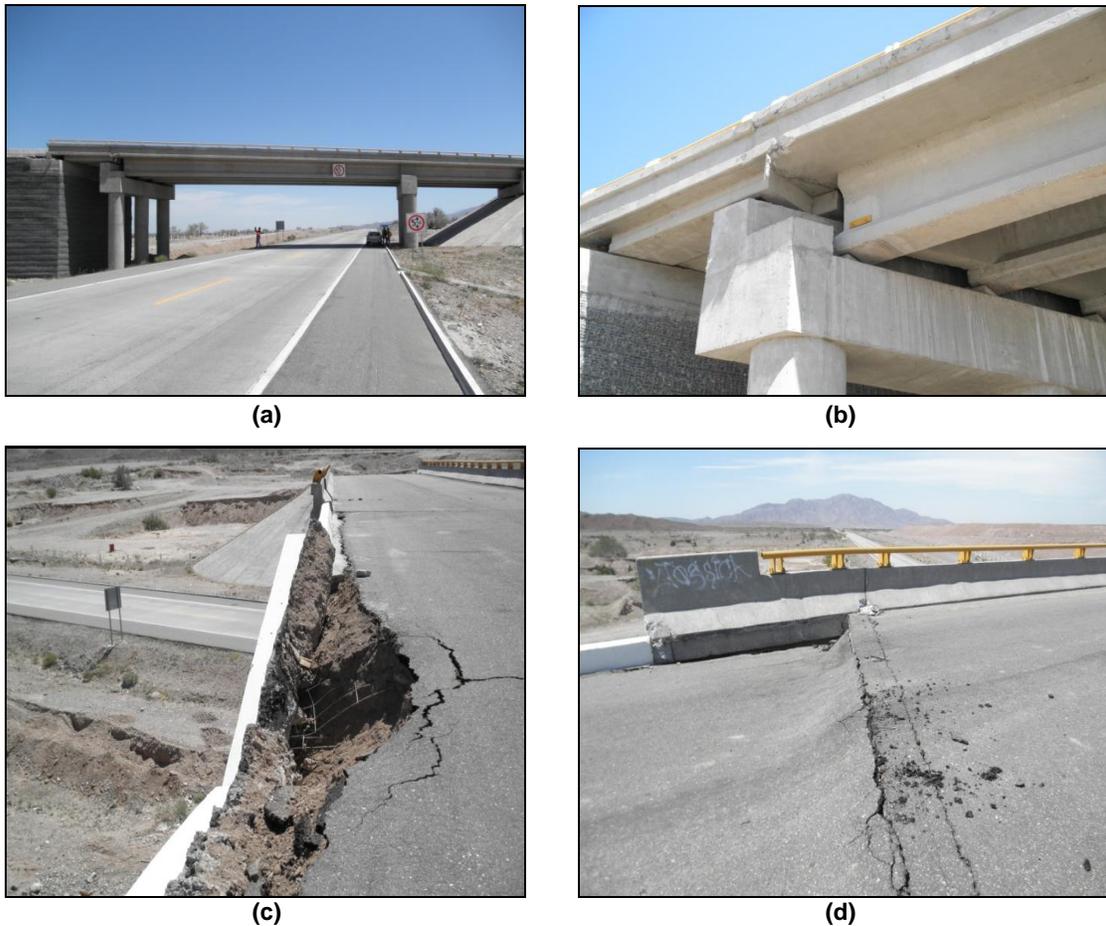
Overcrossing over Highway 2 (a) west view of the spans (b) damage to shear keys and bent cap.
